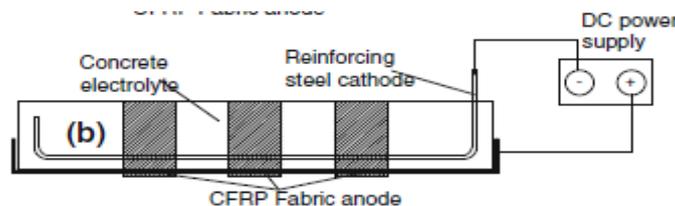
Schematic ICCP application to corroded reinforced concrete beams [24]
